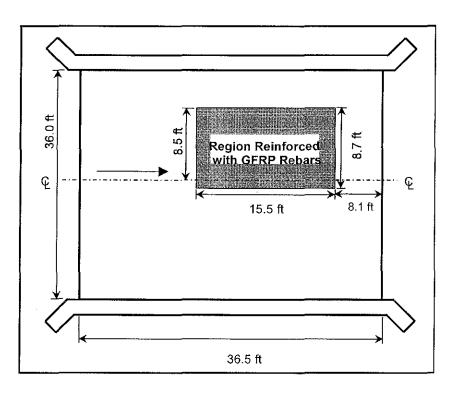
Plan View of Bridge Deck Showing the Location of the GFRP Rebars
